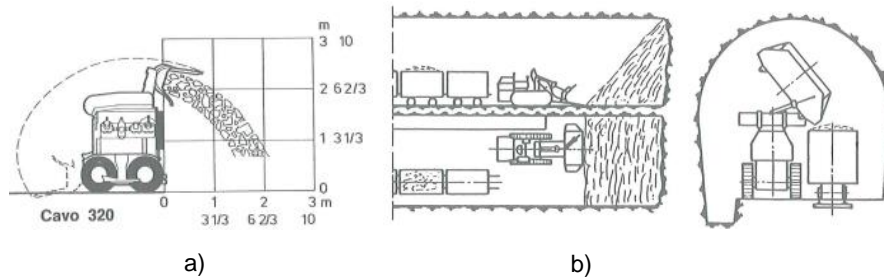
a) overhead loader and b) side-dump loader [L6]
